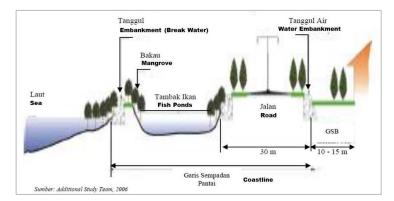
Improvement Plan for Coastal Areas of Banda Aceh considering Tsunami DRR (Spatial Plan of Banda Aceh 2009-2029)
